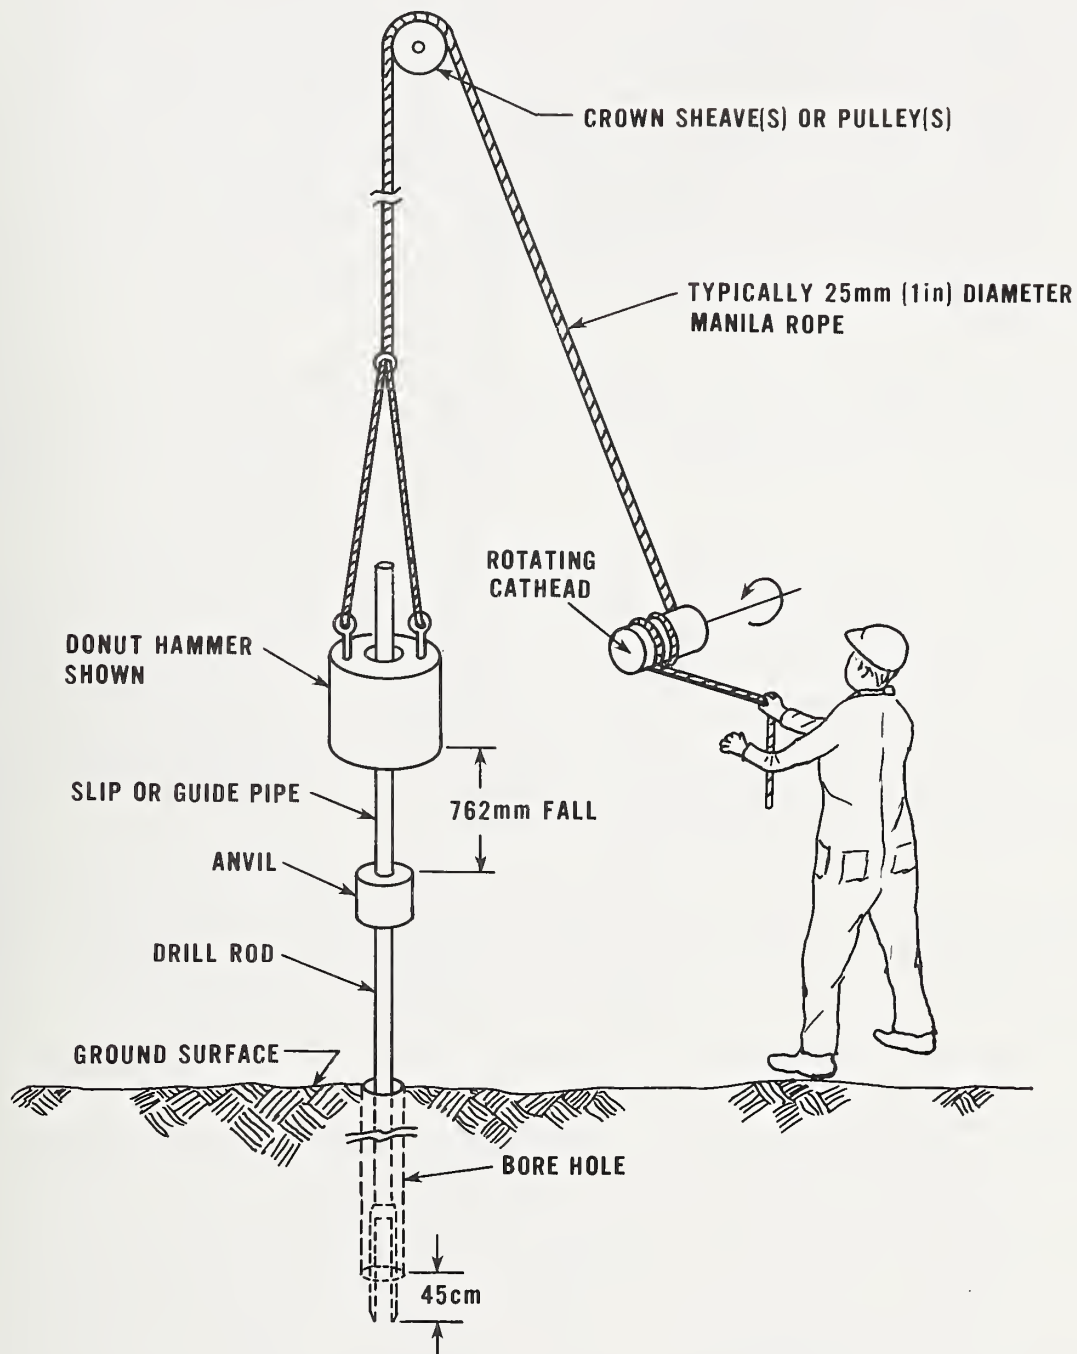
Sketch showing typical SPT cathead and rope setup.
